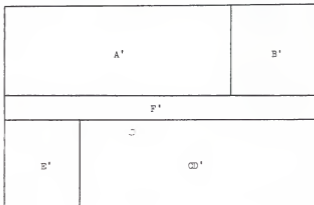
Scheme A Site Plan (key on page 26)Figure 2.2. Scheme B Site Plan (key on page 26)
